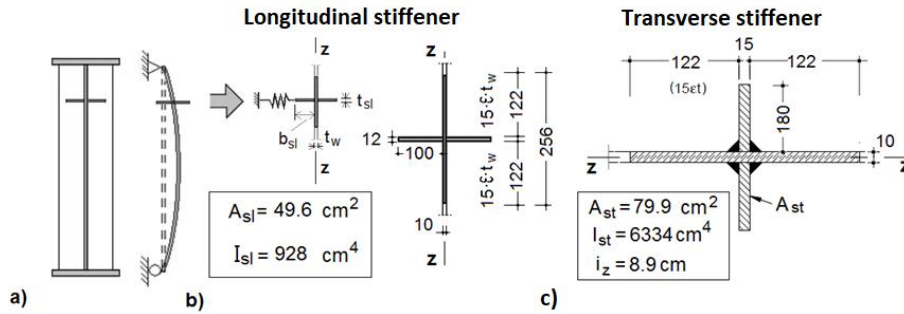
Section and features of longitudinal and transverse stiffening.
